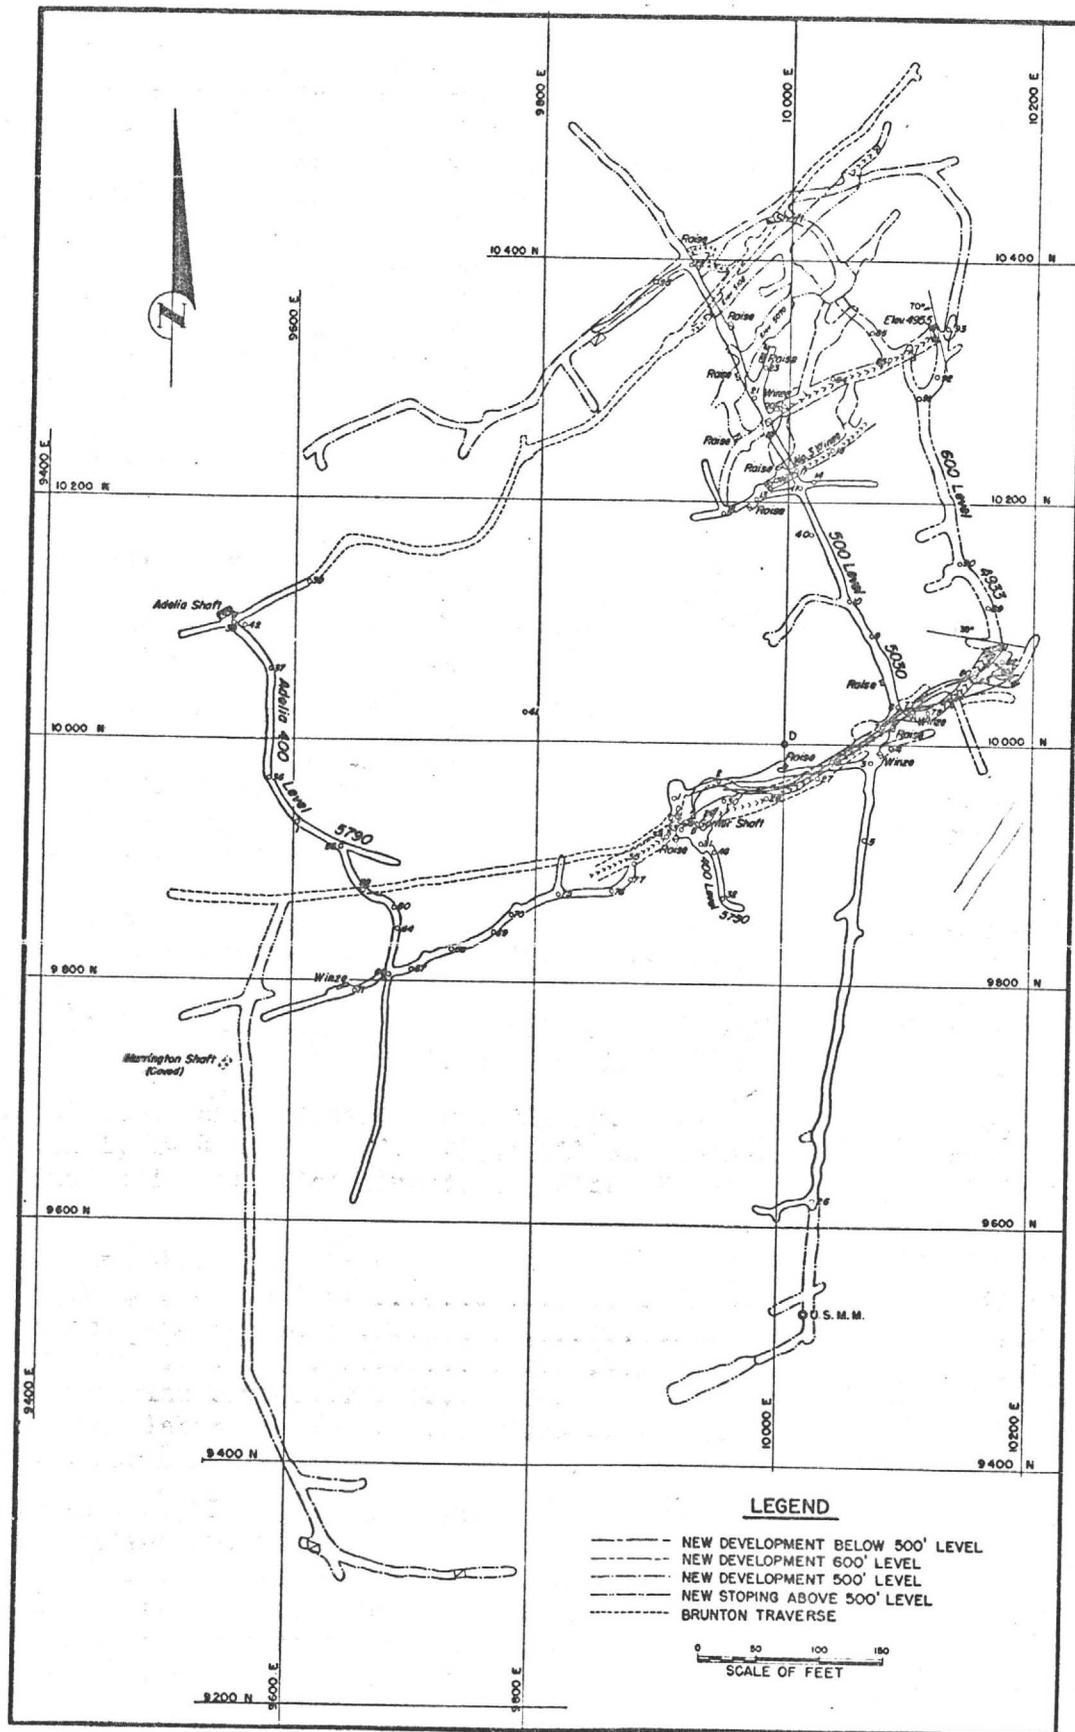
Plan of Harrington-Hickory mine, showing new development and stopes.
